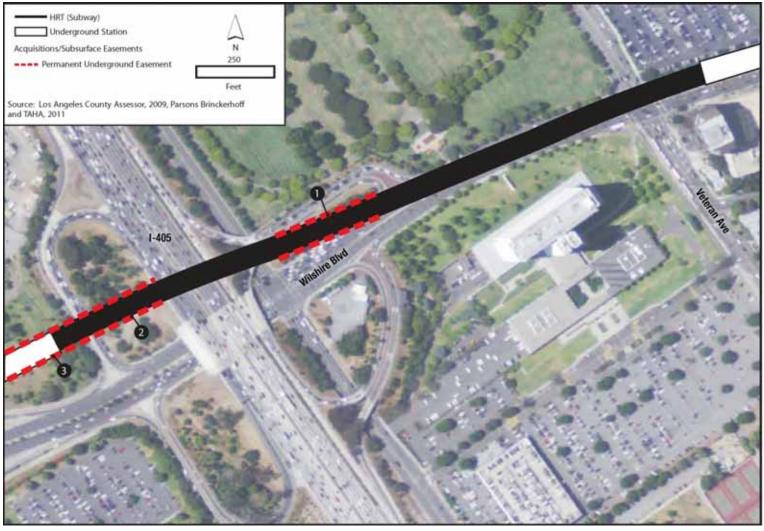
Permanent Underground Easements from Westwood/UCLA On-Street Station to Westwood/VA North Station
